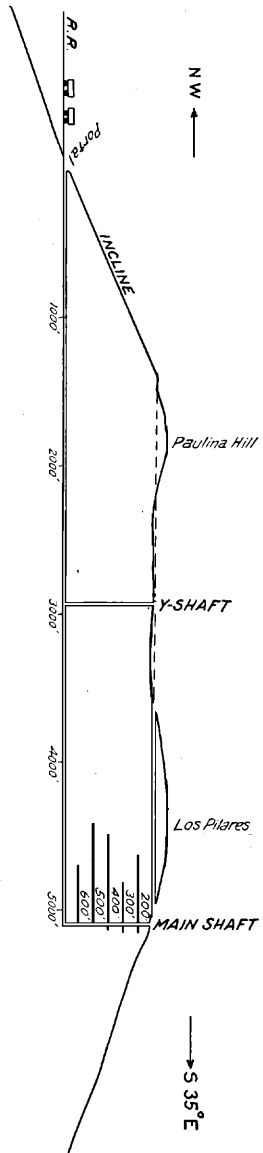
Profile of Los Pilares Ridge on plane of tunnels and shaft.
